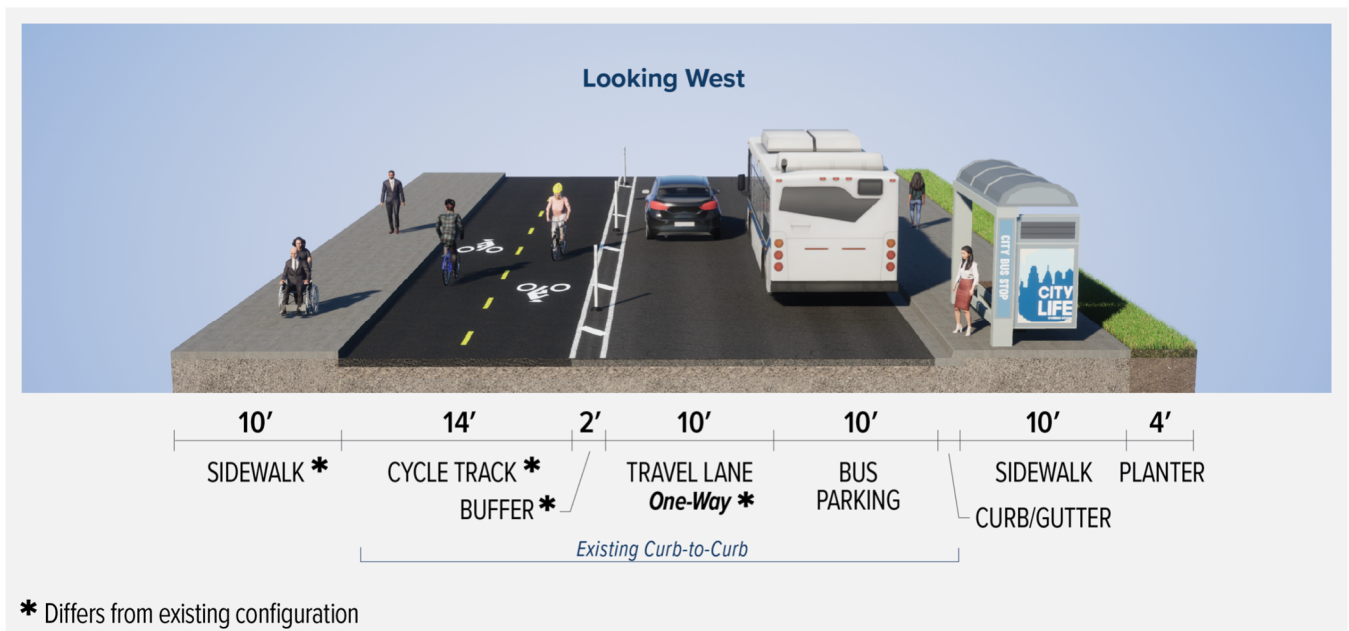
ALTERNATIVE 2 BETWEEN 3RD STREET AND 4TH STREET
